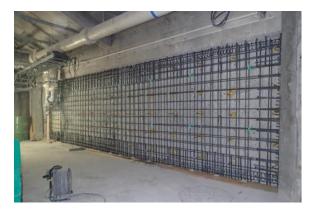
Wall repair (thickening the wall by newly adding a bearing wall)
